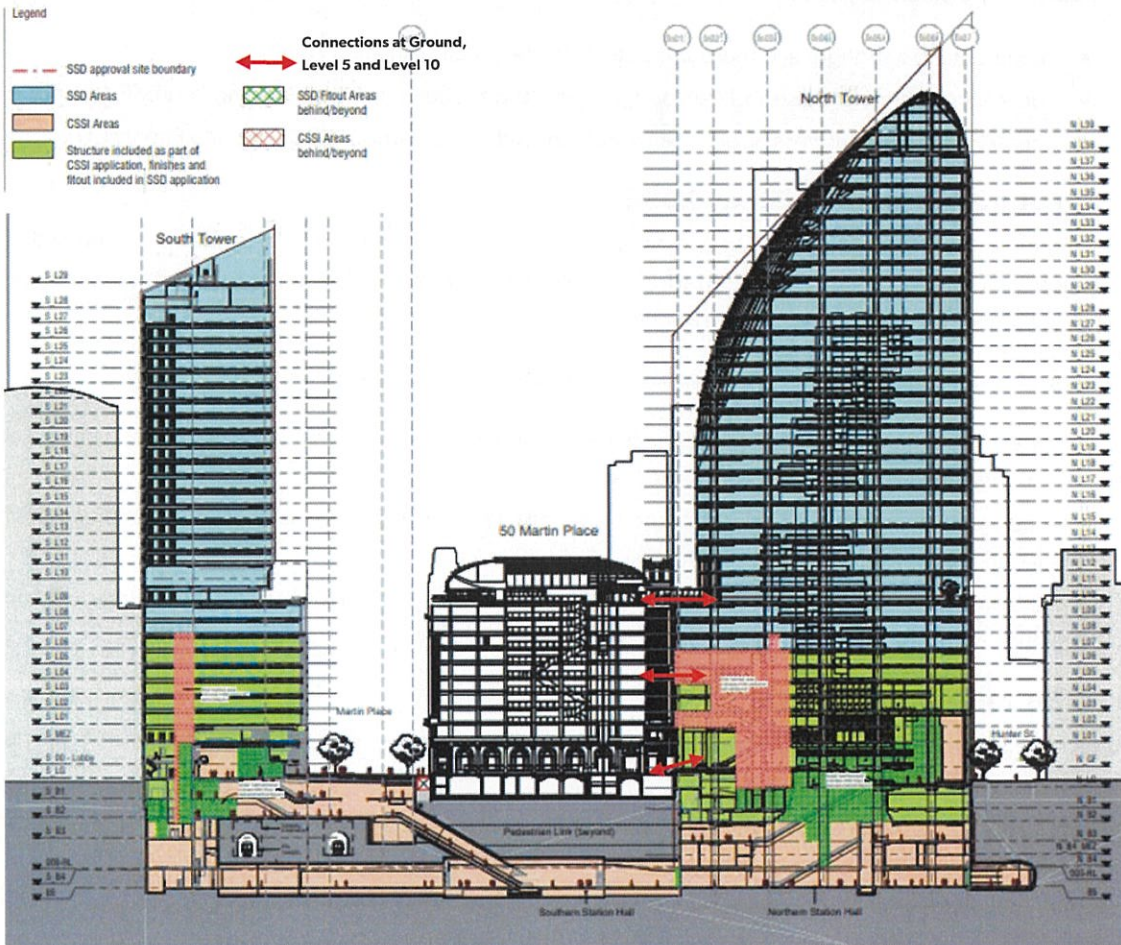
| Section plan showing proposed OSD above CSSI station works (Source: Applicant's RTs)
